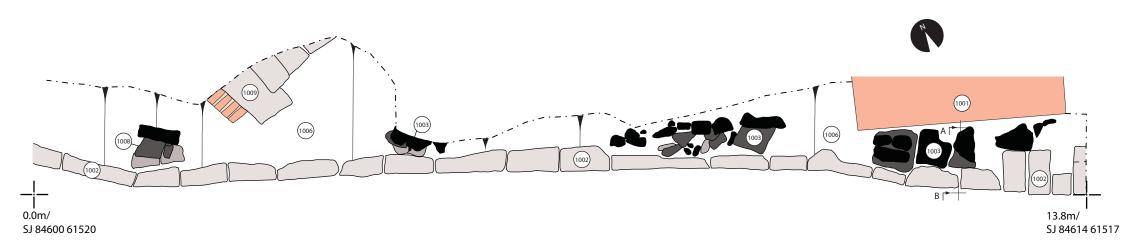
Profile of church yard walls (1002) and (1003). Scale 1:10 at A4. Drawing located on figure 3.
